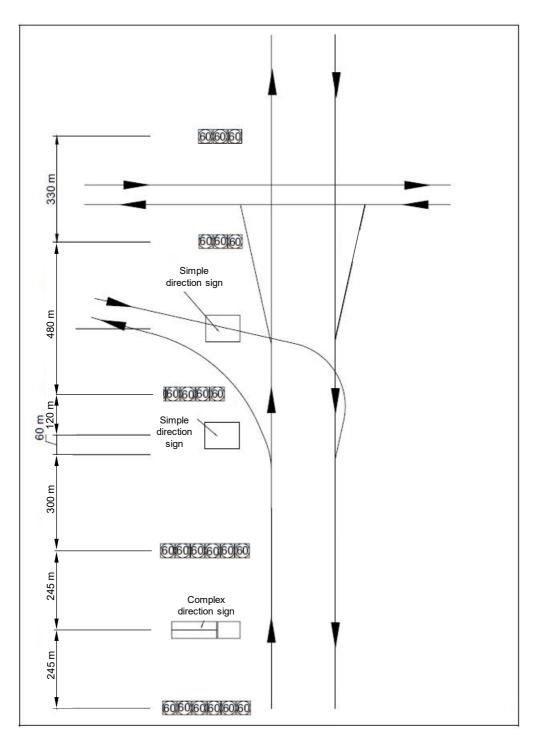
Schematic drawing of alternative LUMS and direction signs layout
